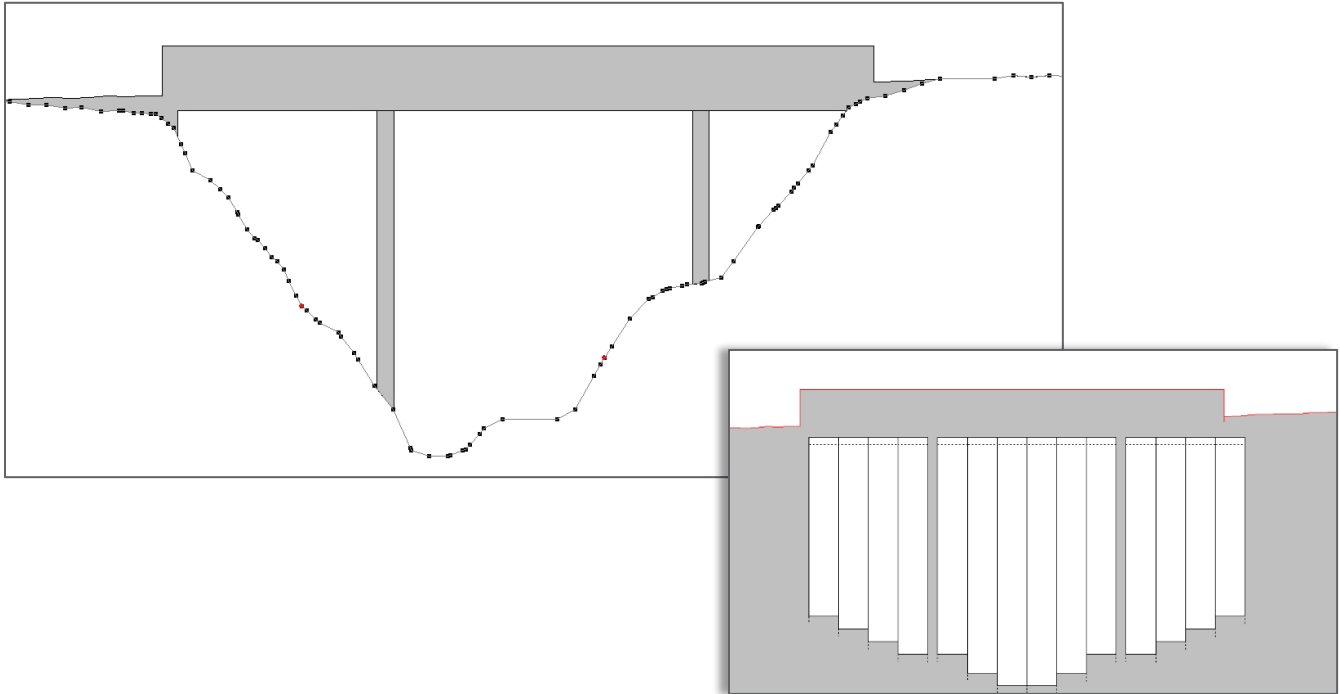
EXAMPLE BRIDGE STRUCTURE PREVIOUSLY APPROXIMATED AS CULVERT
